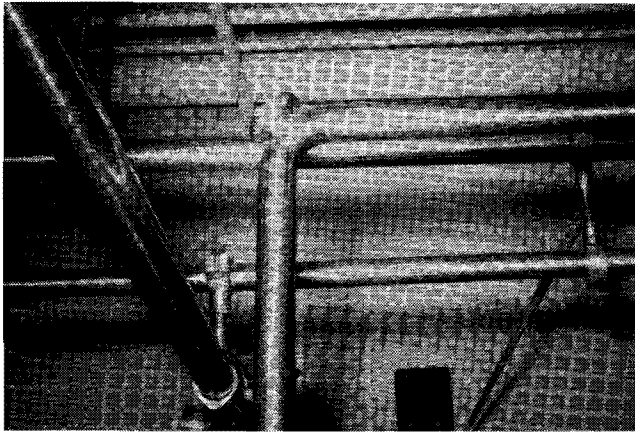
A Section of Piping Showing a Specially Constructed Inspection Port.
